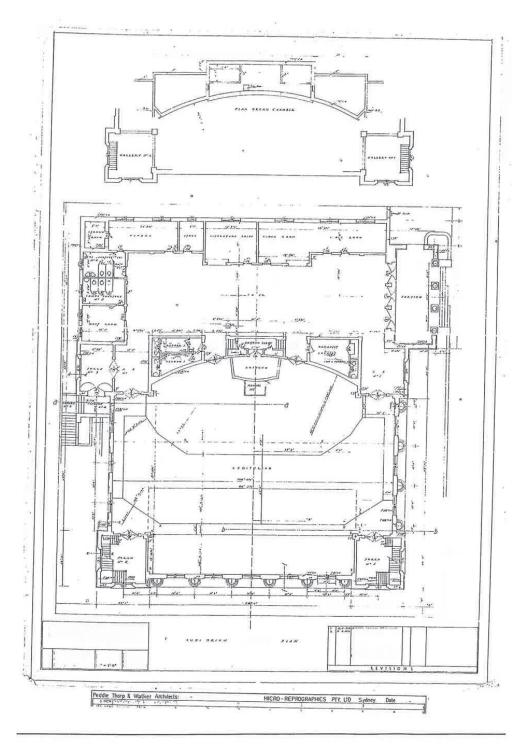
Auditorium floor plan, 1926 (Source: Conservation Plan 2000)
